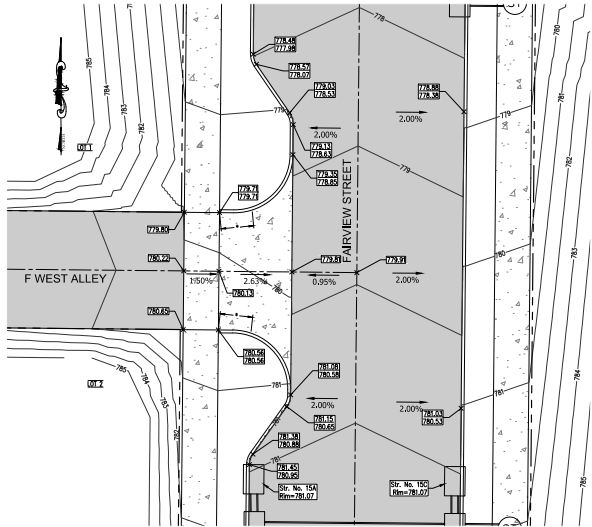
DETAIL A - FAIRVIEW & SOUTH ALLEY INTERSECTION
